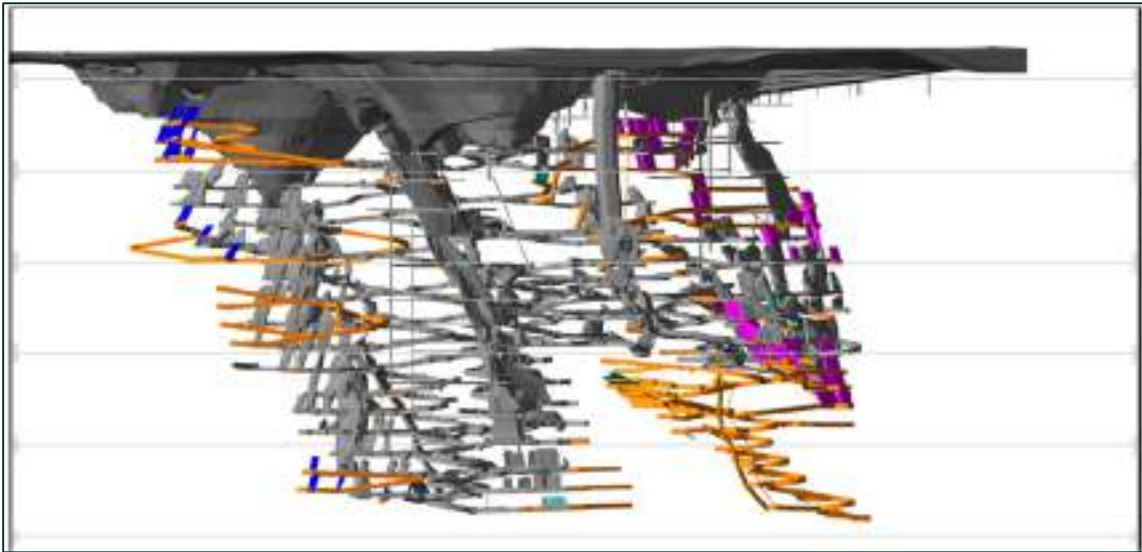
Paddy's Flat underground Mineral Reserve design with existing pit (grey) looking north - Source: Westgold.
